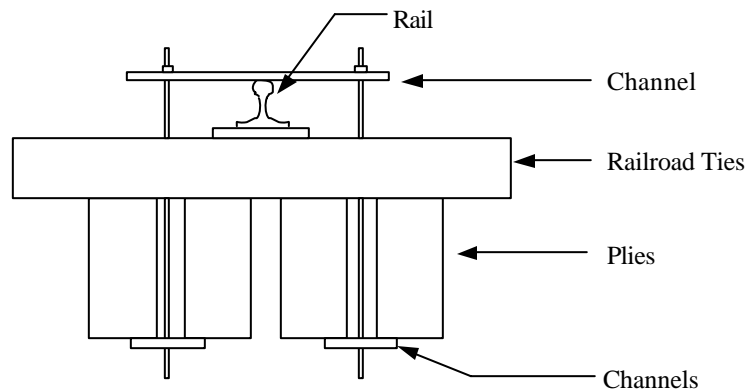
Cross-Sectional Schematic of Rail Tie Down Configuration
